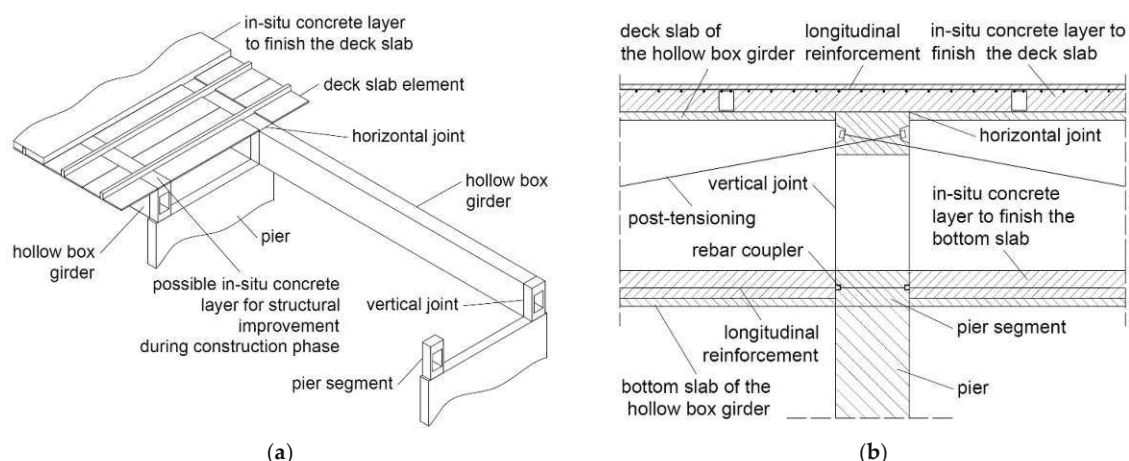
Concept of the new LT-bridge construction method (drawings based on [12]): (a) construction process, showing the resulting horizontal and vertical joints; (b) longitudinal section over the pier, highlighting the continuous reinforcement in the deck and bottom slabs due to the in situ layers.
